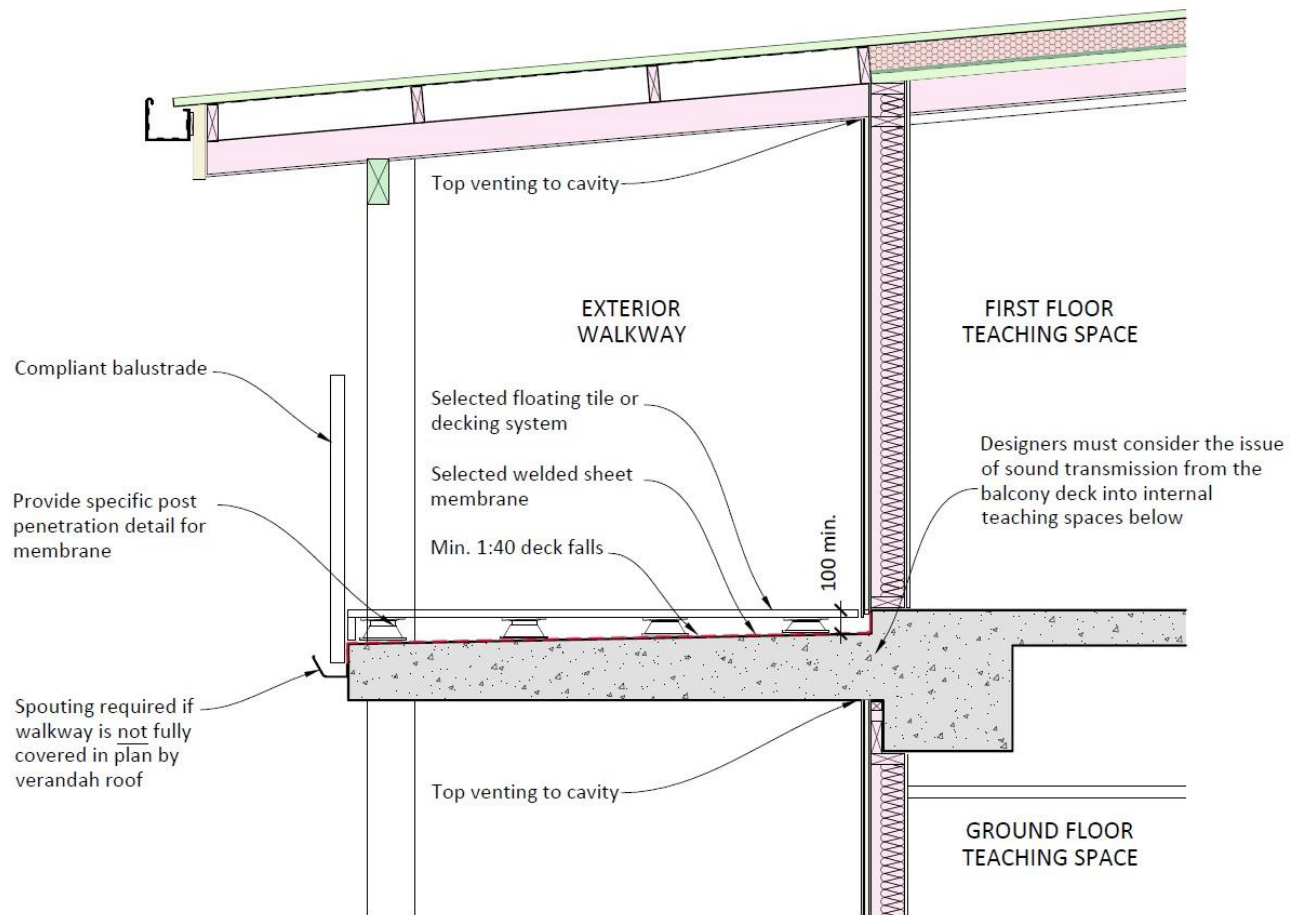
Waterproofing to Upper Decks – Non-trafficable Membrane with Floating Deck/ Tiles
